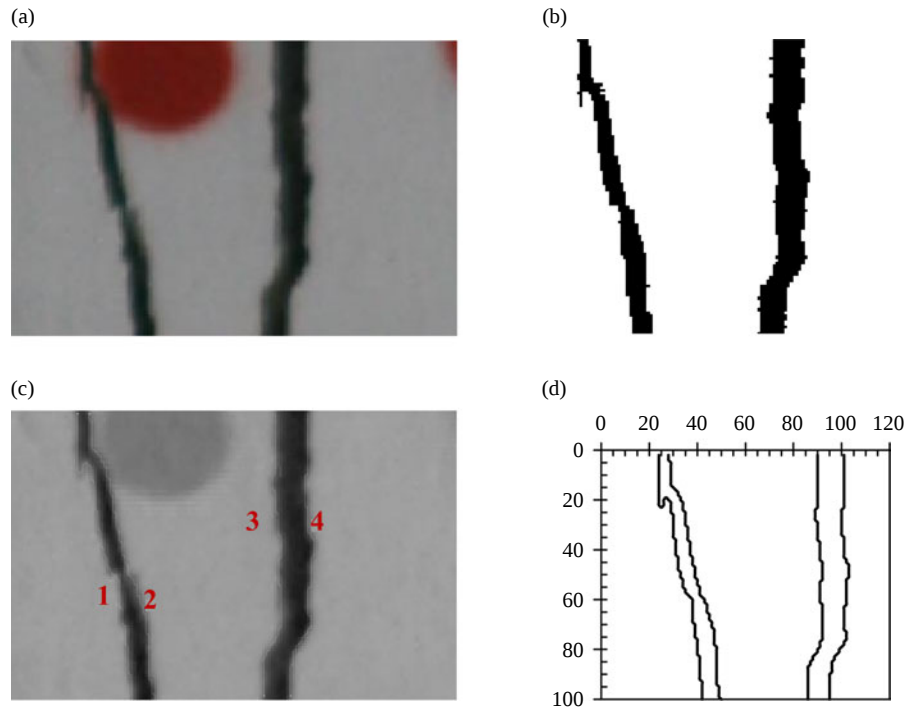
MCrack: (a) image, (b) detection of cracks, (c) definition of edges and (d) geometrical characterisation of the cracks.
